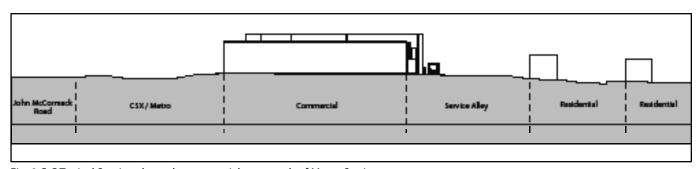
C-C Typical Section through commercial area north of Metro Station
